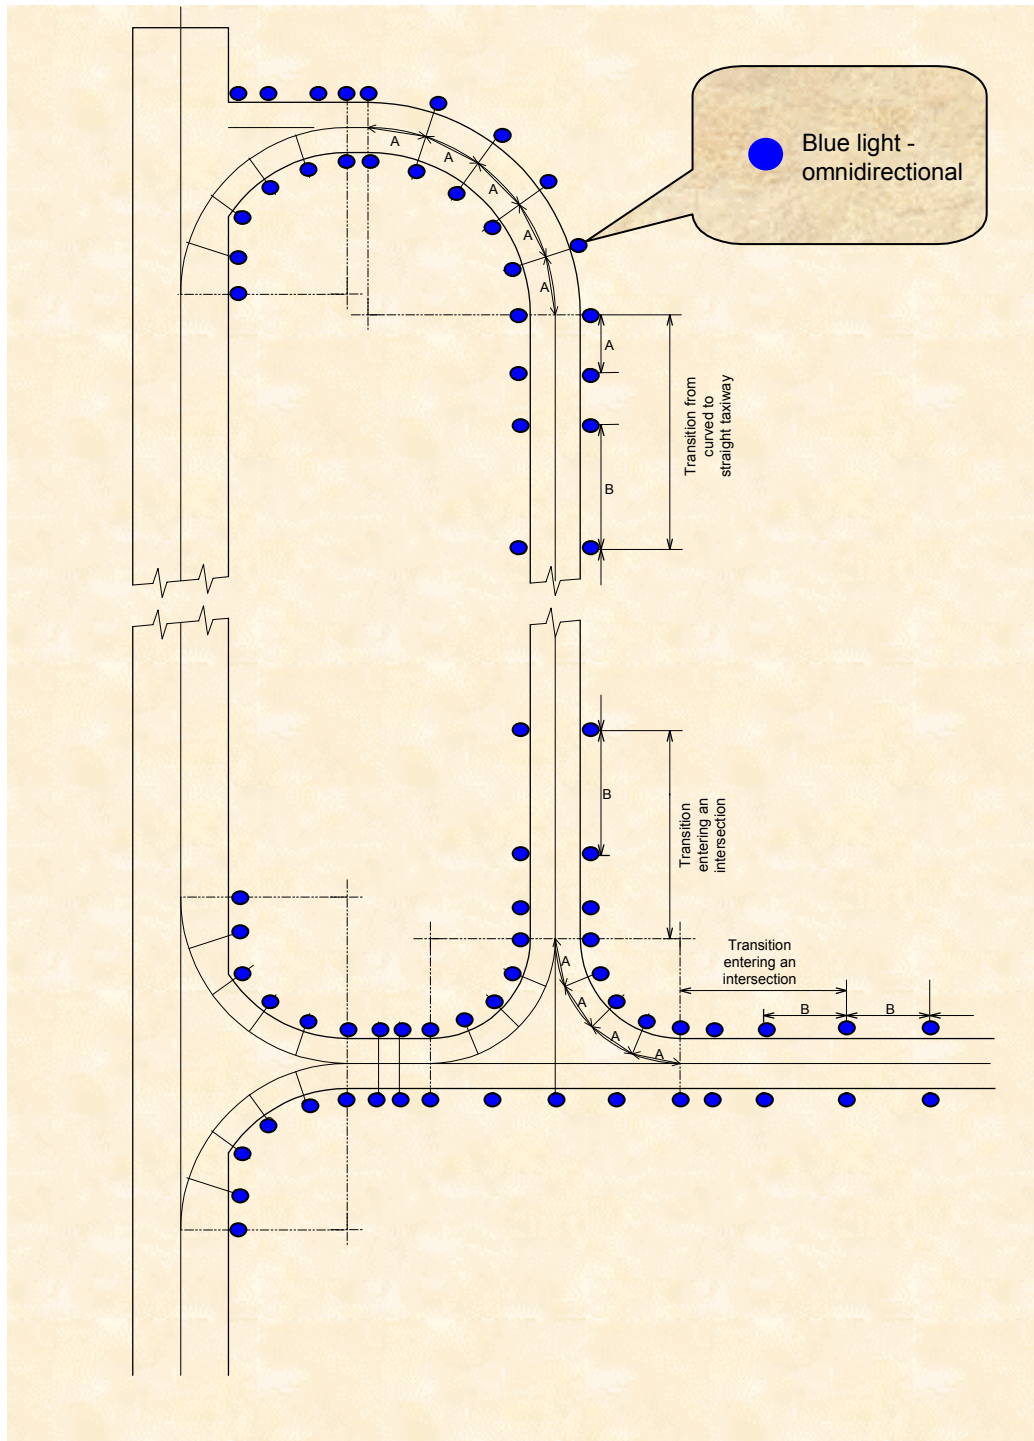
Typical Taxiway Edge Lights Layout
